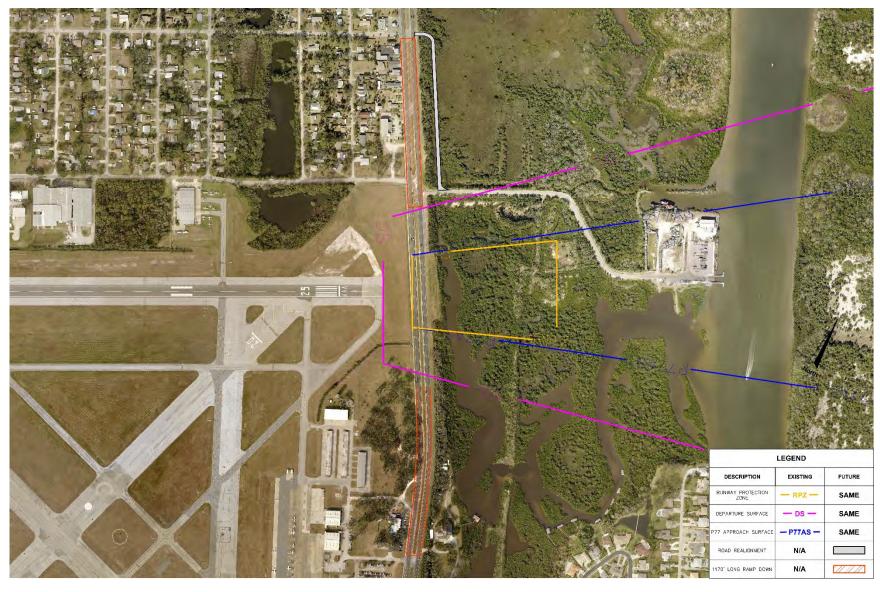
ALTERNATIVE 2B: TUNNEL BENEATH RUNWAY 25
